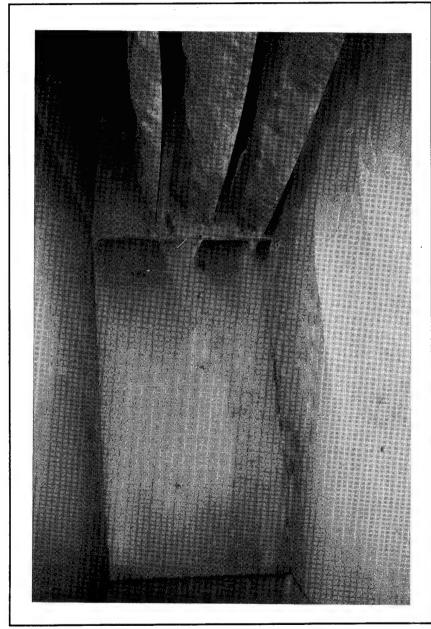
Collector end of mechanical dust collector to air heater breeching.
